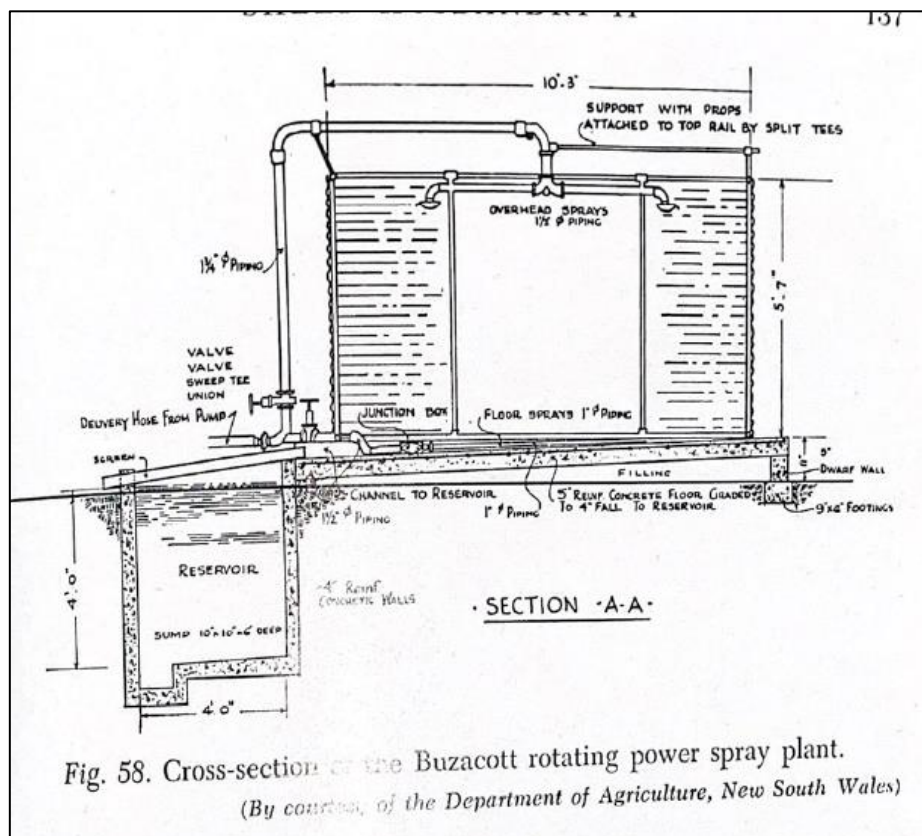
Cross-section of the Buzacott rotating power spray plant.
